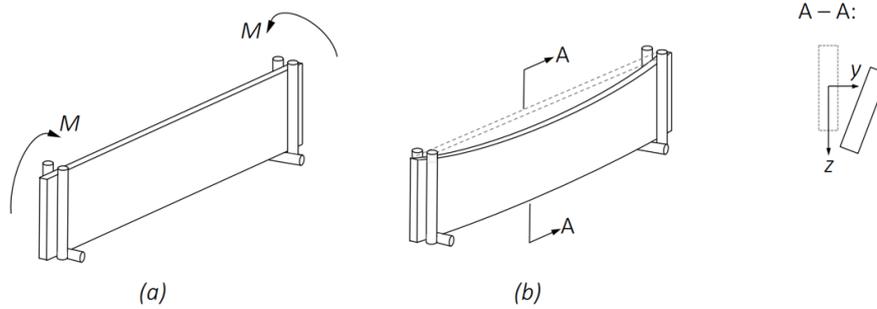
Lateral torsional buckling of a simply supported beam subject to constant moment. (a) simply supported beam with restrained supports, (b) buckled beam (Blaß & Sandhaas, 2017)
